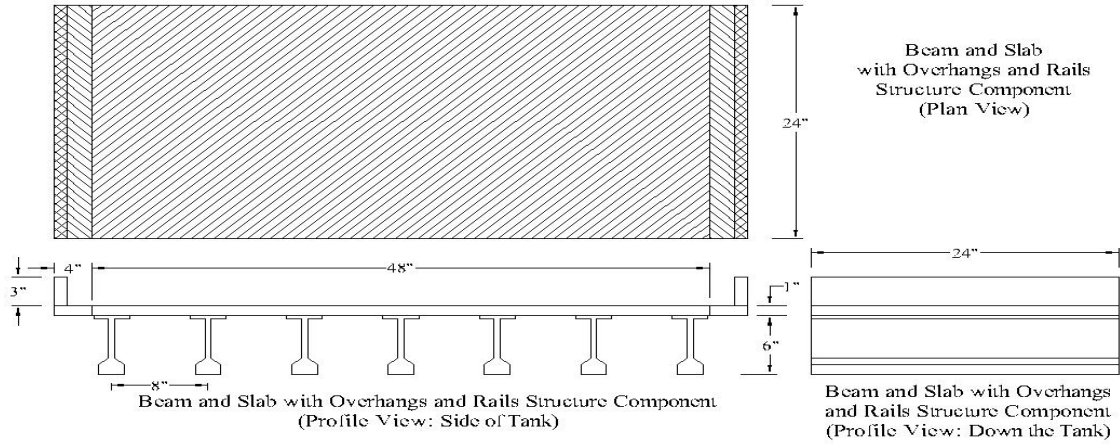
13 Model beam and slab structure with overhangs and solid rails.
